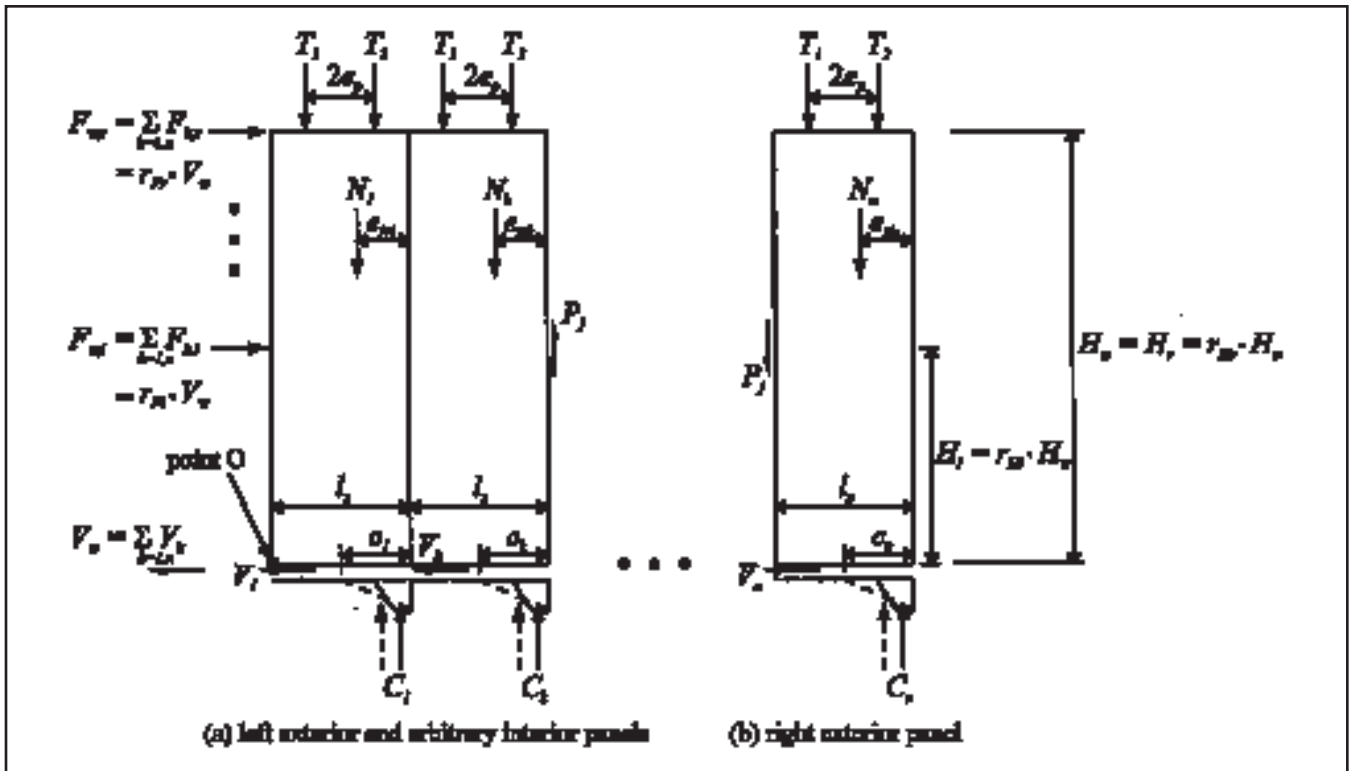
Forces on an unbonded post-tensioned precast concrete wall with multiple panels.
